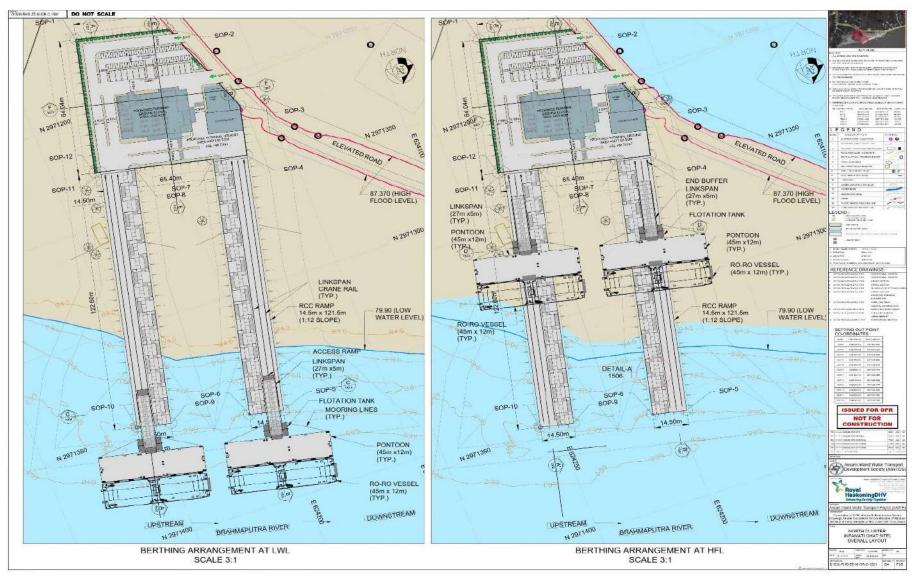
Layout of Neamati Ghat Terminal including Pontoon Linkspan and Sloping Access
